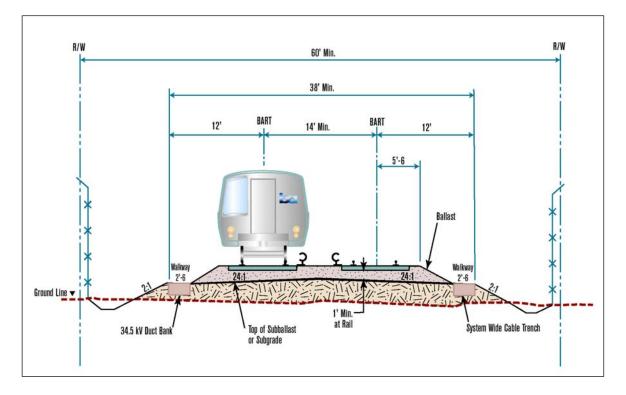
Conceptual At-Grade Cross Section for BART Alternative
